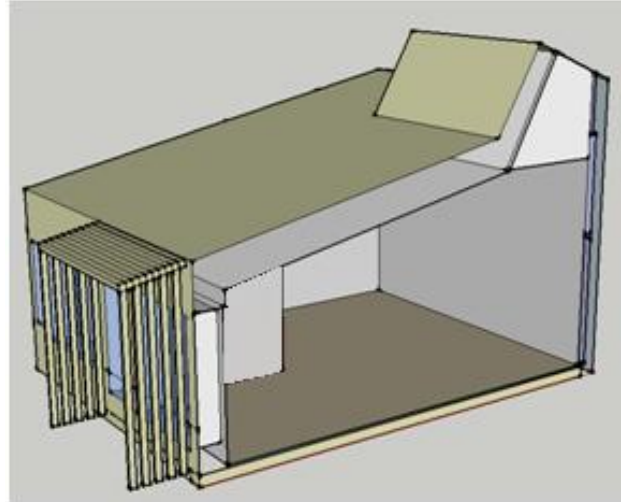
Section cut of the simulated common room. Wooden pergola construction in the front and skylight construction in the back of the room.
